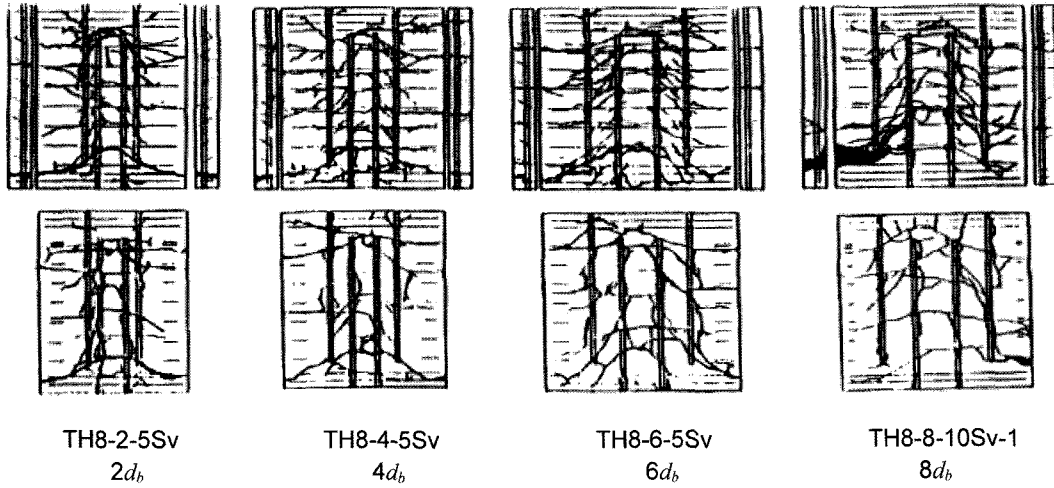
Surface concrete cracking patterns at failure for different splice-bar spacings of Sagan *et al.*'s test
